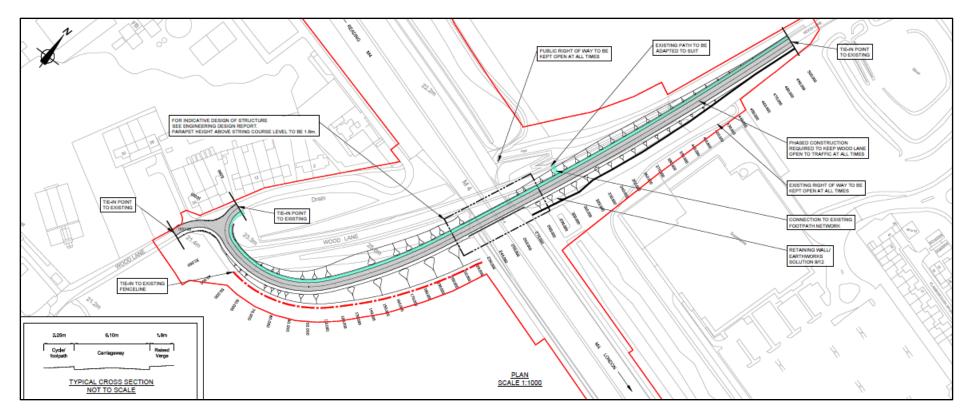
2015 DCO Design of Wood Lane overbridge side road
